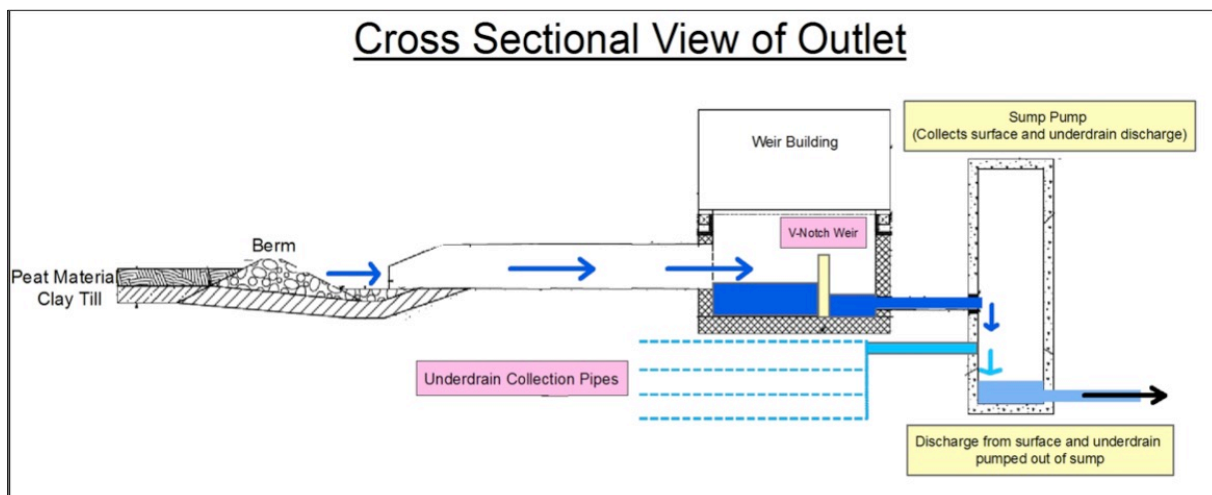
Cross-sectional view of the outflow pump in SFW. Surface and near-surface water flows in from SFW, through the weir building, mixing with water from underdrains in the sump pump and is then discharged.
